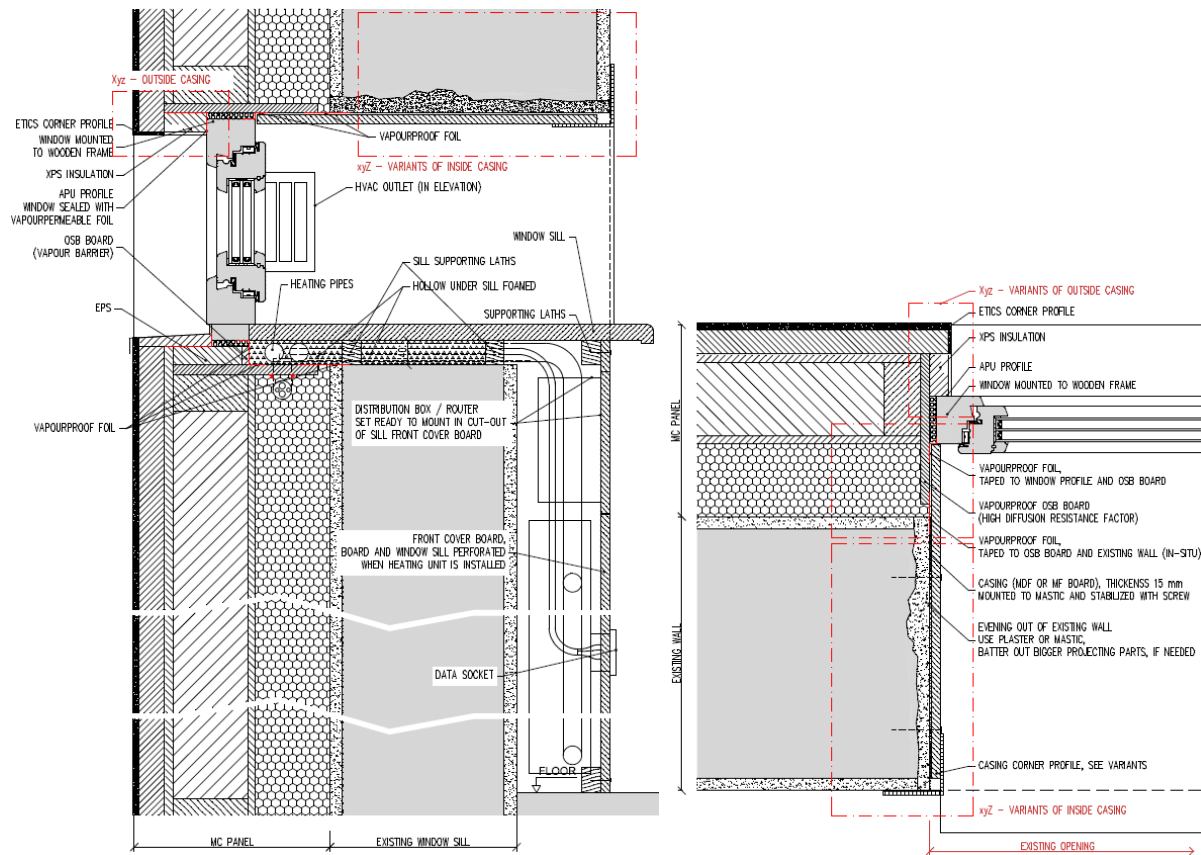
A detailed cross-section (left) and floor plan (right) of the window siding. The alternatives of different casing and integrated elements were considered and designed.
